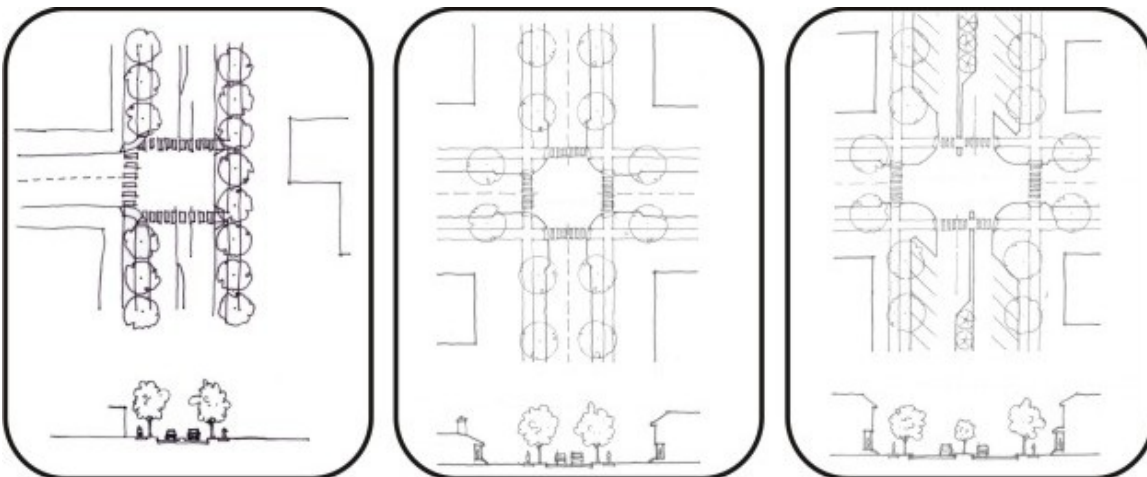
Left Box: 3200 South Section. Middle Box: Local Street. Right Box: Town Center
